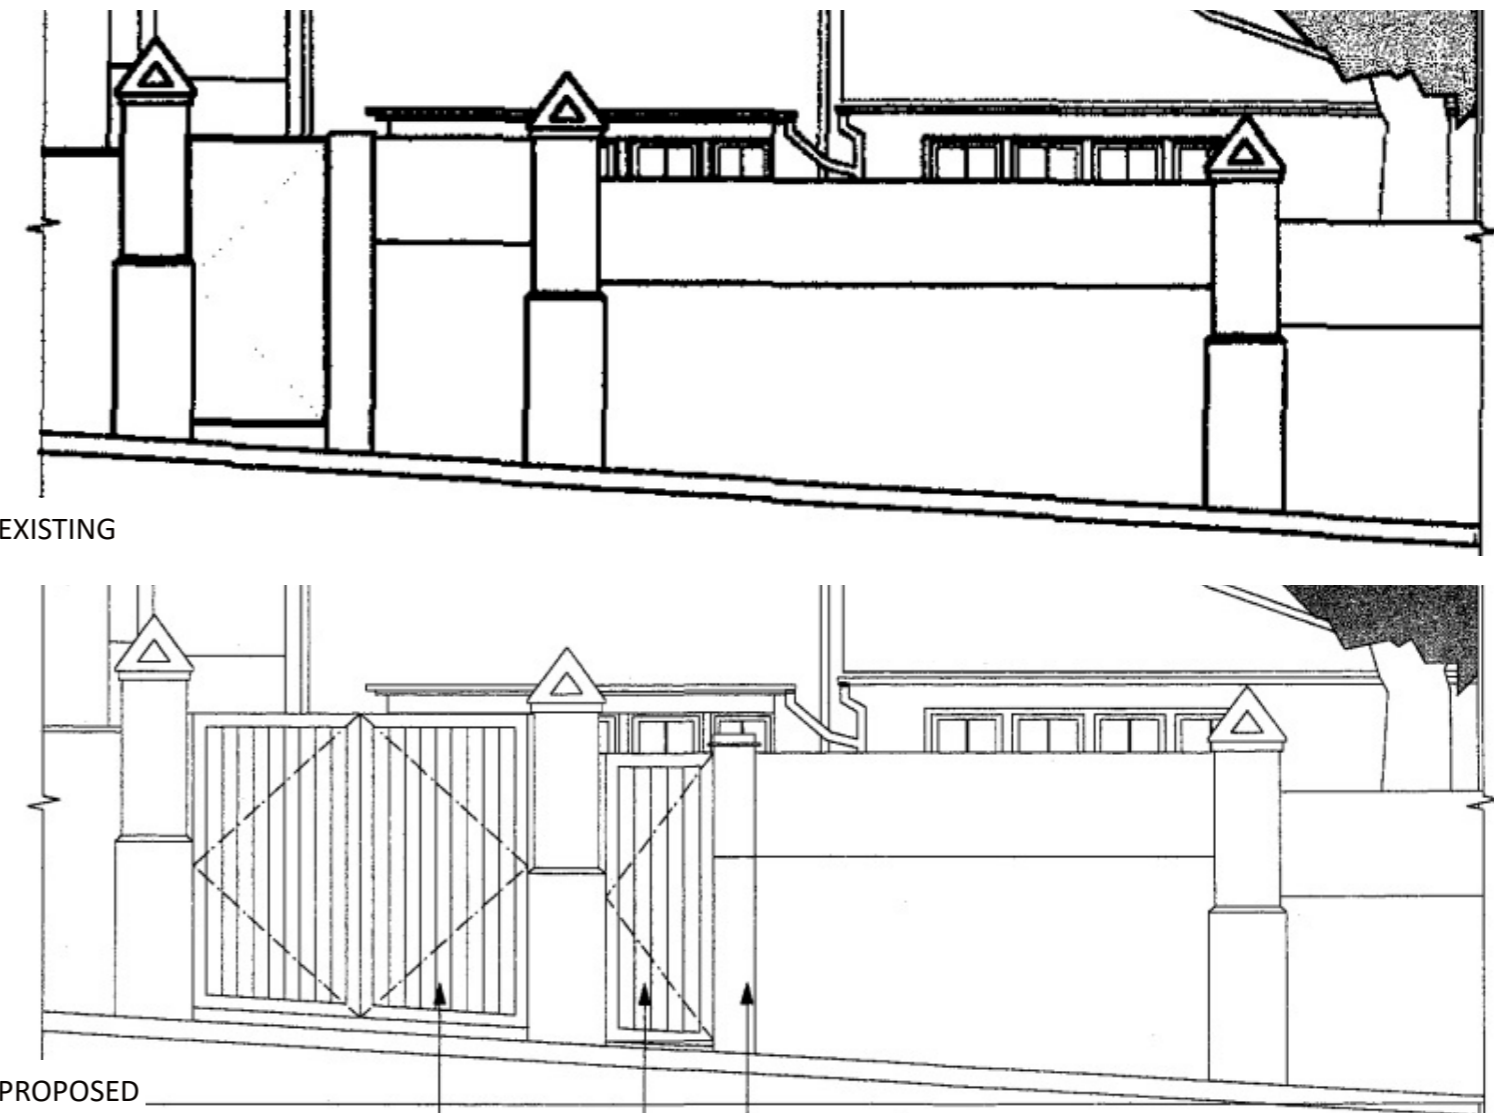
78 Fitzjohn's Avenue - Existing and Proposed street boundary
